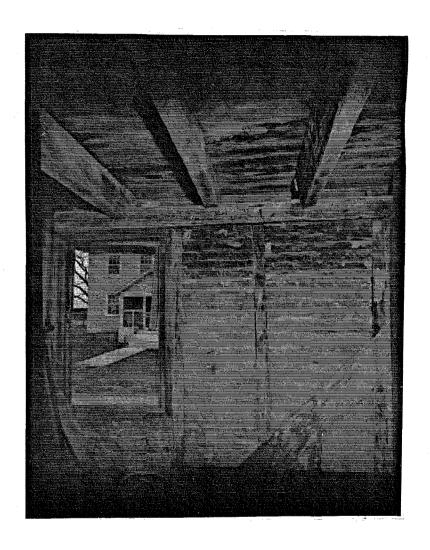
Hermitage Quarter, first floor: view of east wall looking east.
